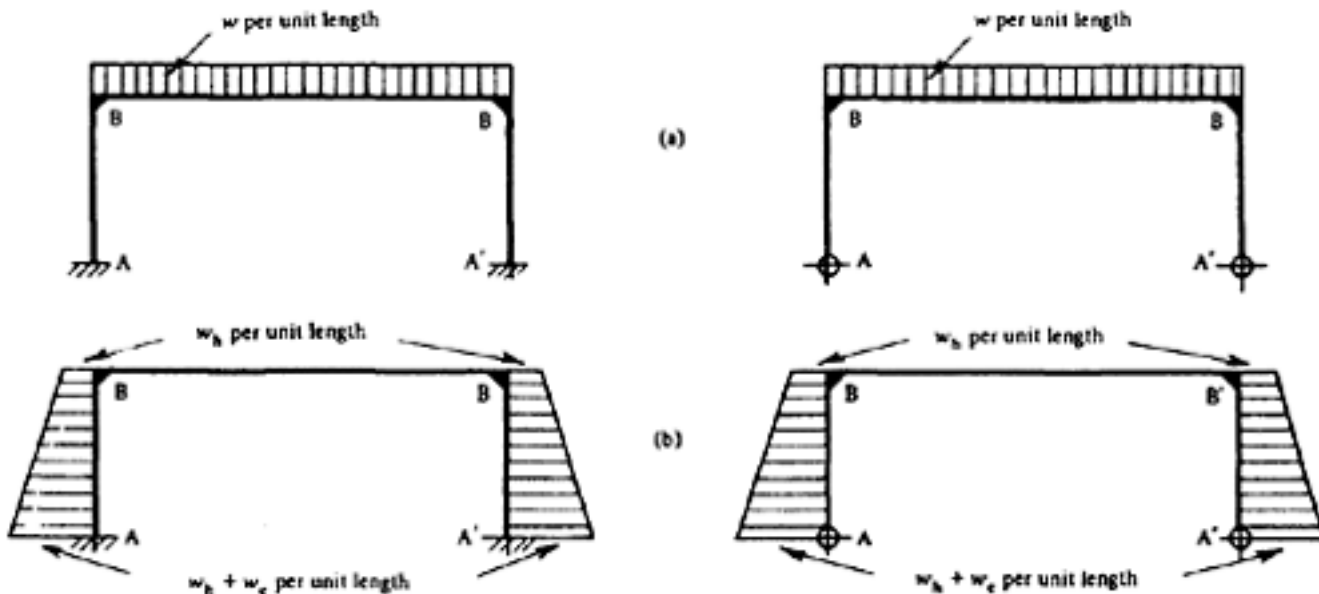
Symmetrical, vertical and horizontal loading for single bay fixed and two-hinged frame
